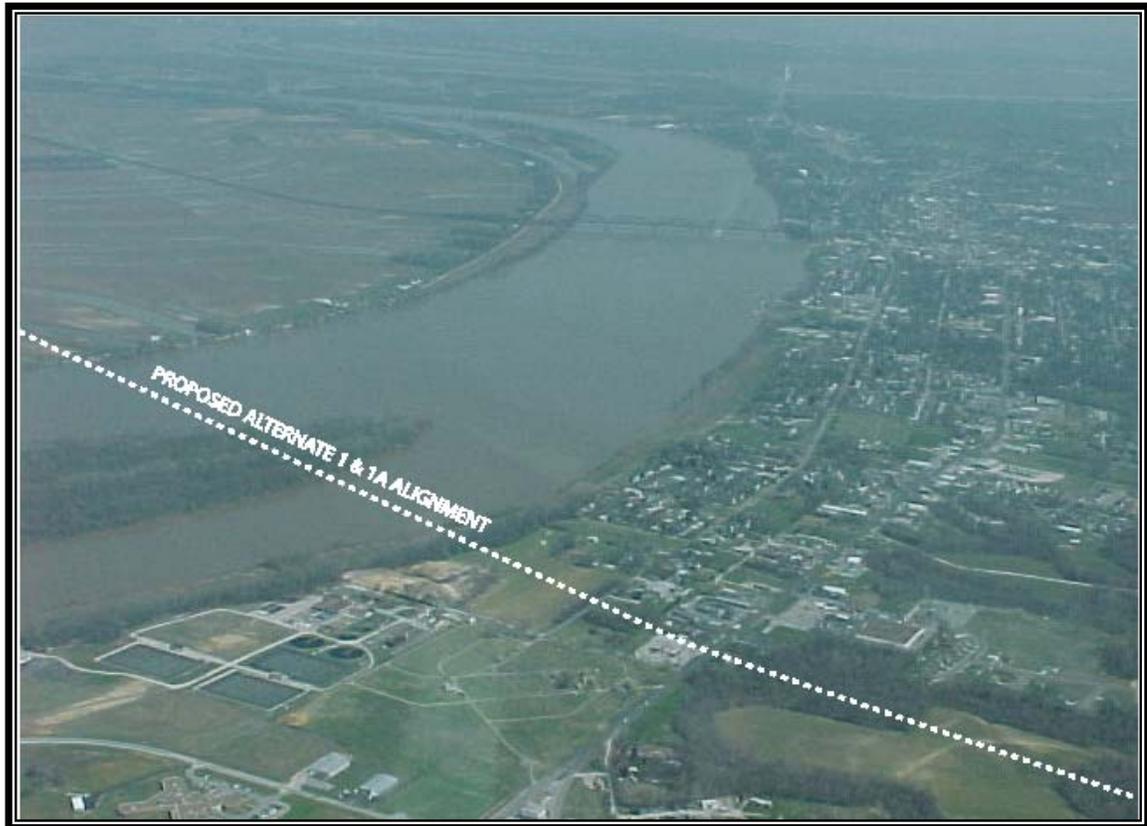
Proposed Alternative 1 & 1A Alignment
